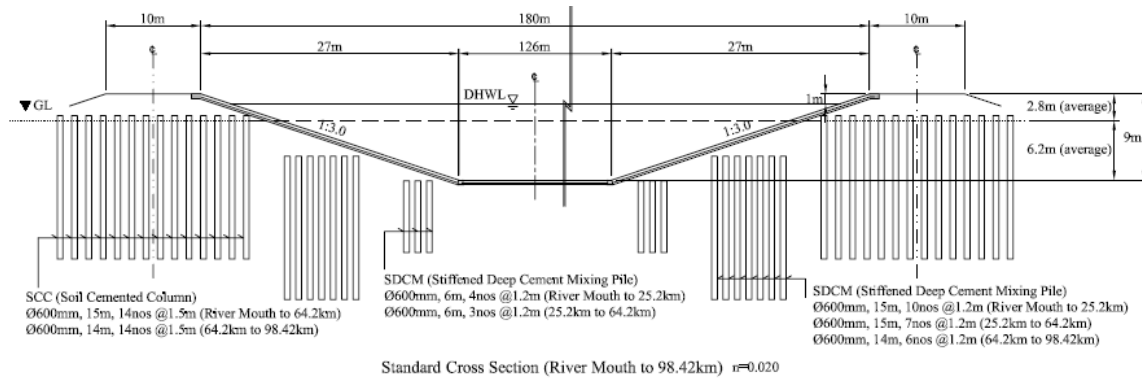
Alternative Cross Section of Outer Ring Road Diversion Channel with Slope and River Bed Protection
